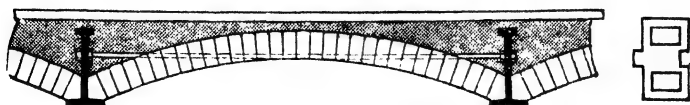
Early Form of Hollow Brick Floor Arch.
